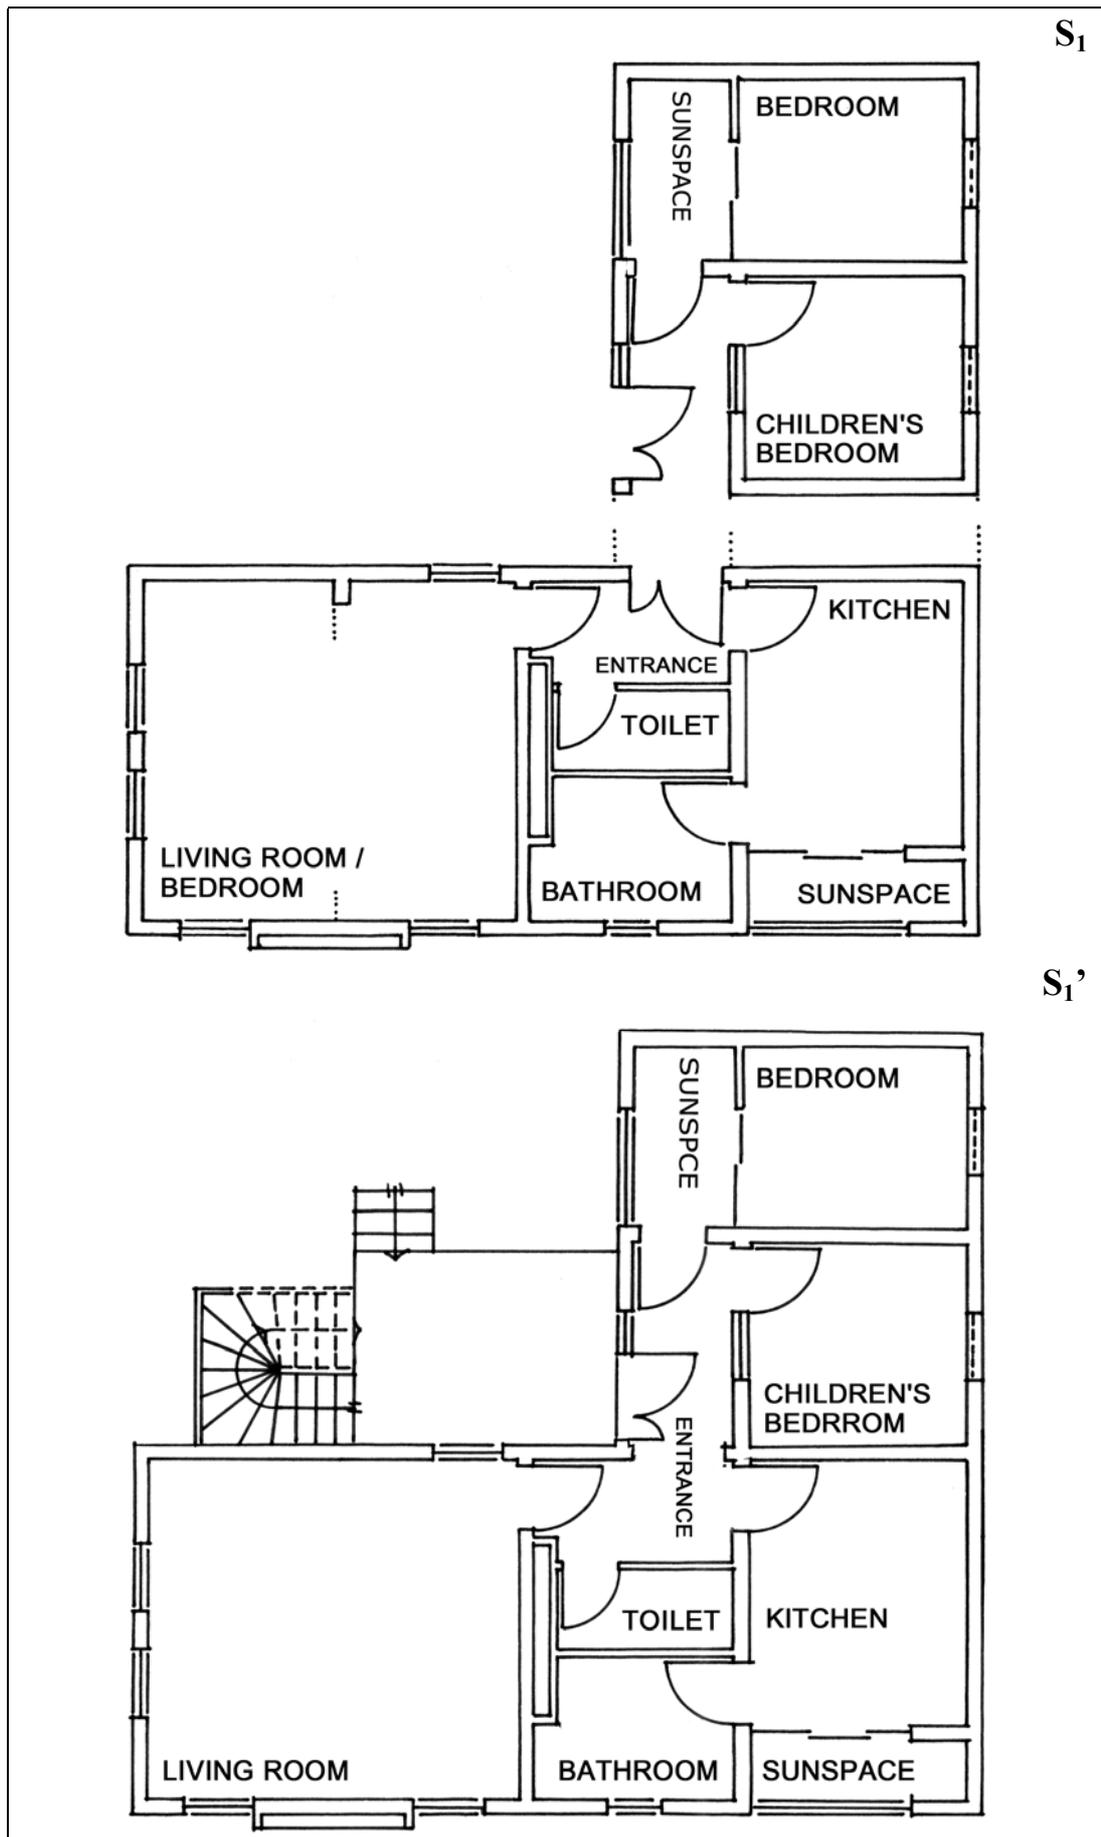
Plans of types S₁ and S₁' dwelling (house with northern entrance); Scale 1/100
